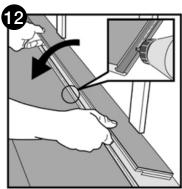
and fig 12. Cut off the vertical locking part of the strip with a chisel, put applicable glue on the strip and push the planks horizontally together. If necessary place some spacers between last board and the wall during the hardening.
